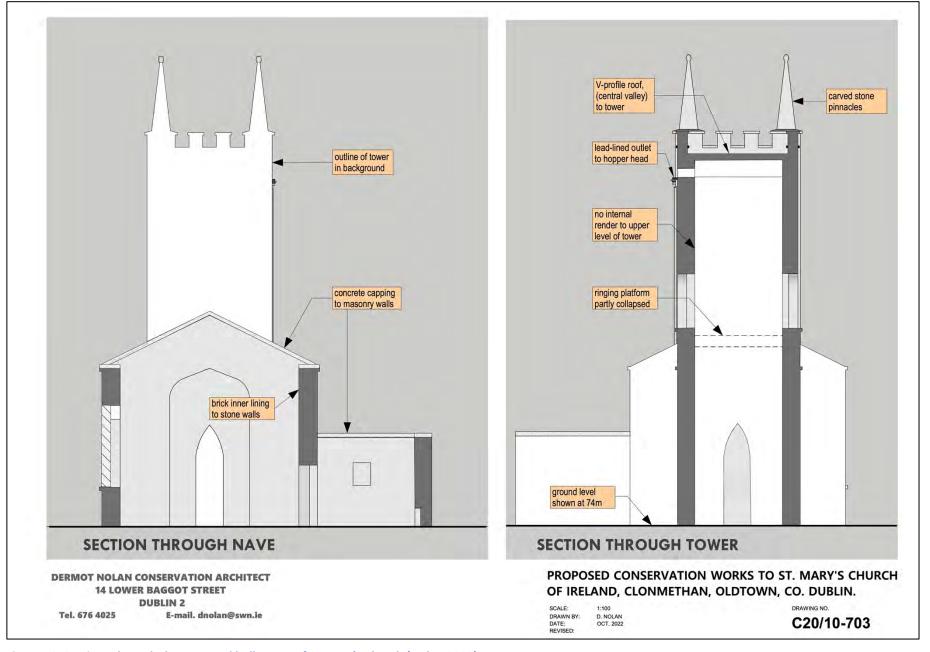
Sections through the nave and bell tower of St Mary's Church (Nolan 2022).
